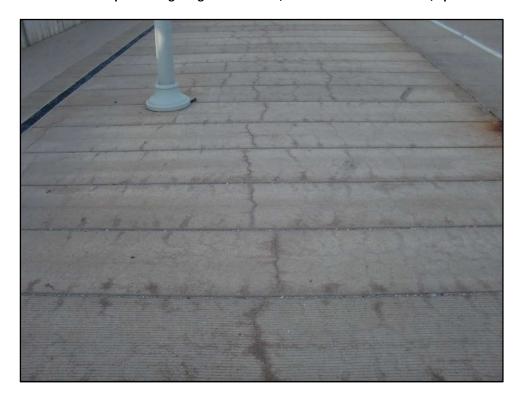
Typical Longitudinal Cracks, 2003 Linear Park Sidewalk.
